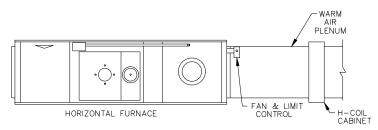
An acceptable location for the air conditioner evaporator coil when used with a horizontal furnace.
